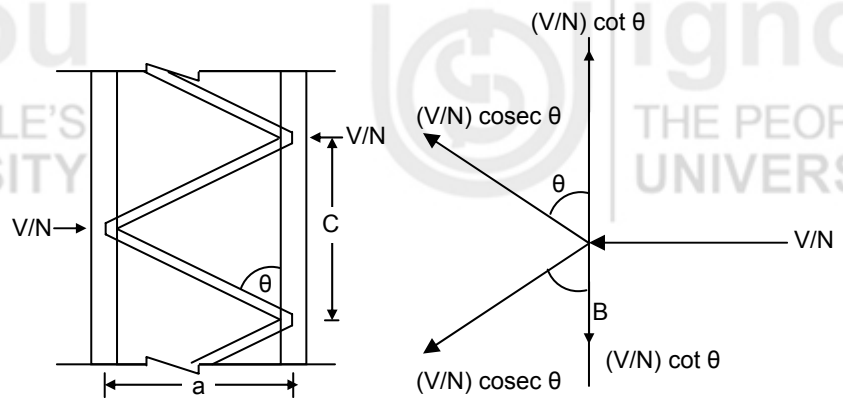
Forces Acting on Lacings and Tie Plate
